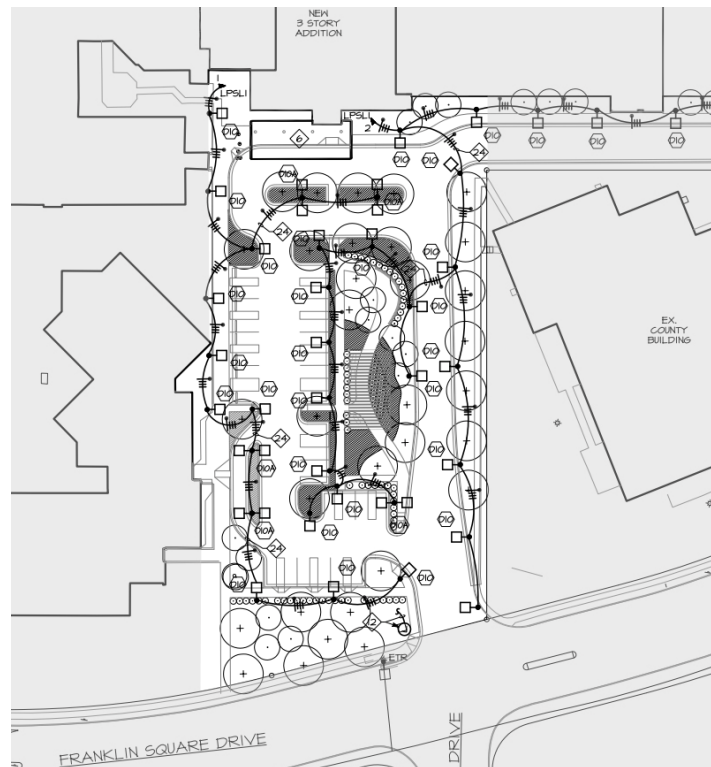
Main entrance and parking lot site plan, not to scale (dwg. E02.SB)
